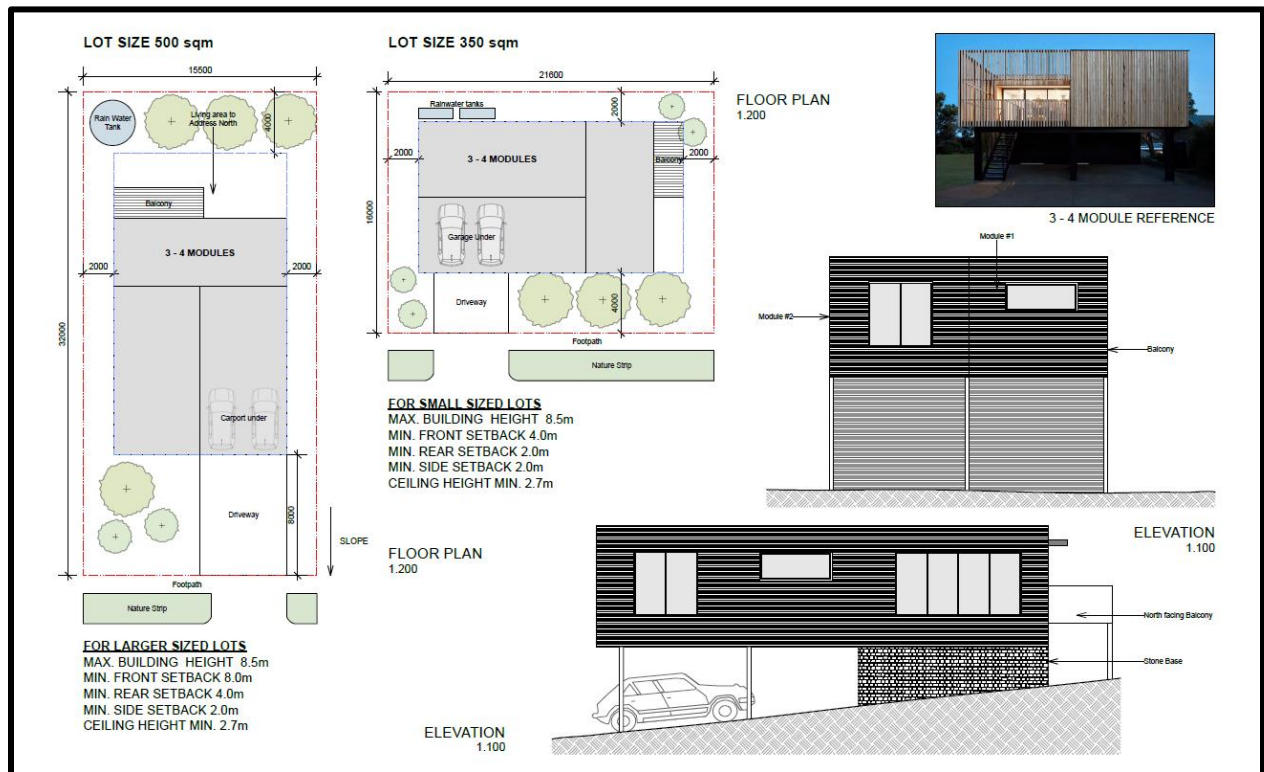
Typical Detached Dwelling (Source: Robert Harwood Architects)
